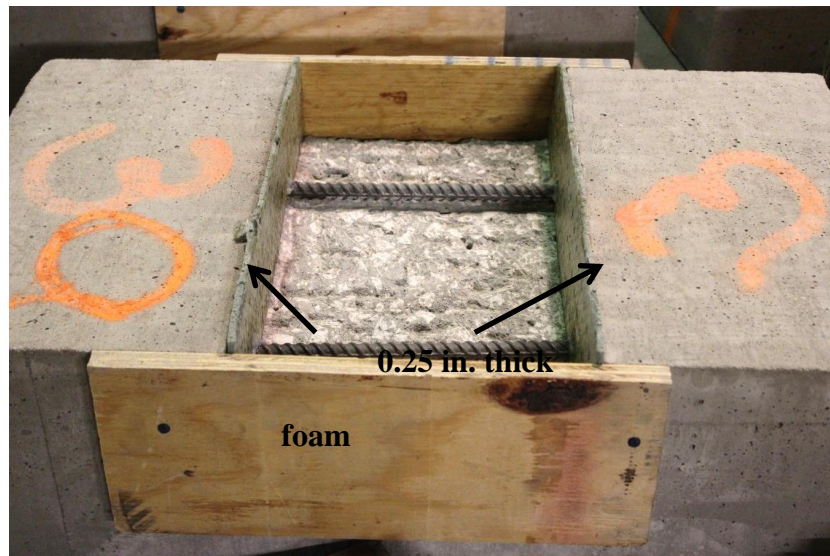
Pull-off test formwork for overlay concrete placement (Case 4)
